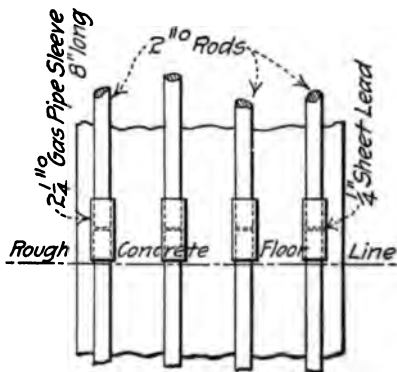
Column Rod Splice, Twelve-Story Loft Building.
